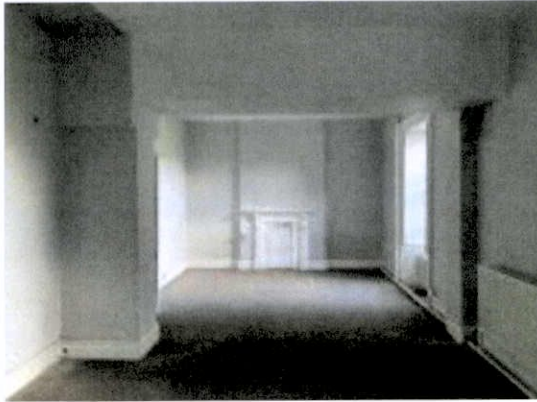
Amalgamated rooms to west. Original chimneypiece and window boxes.
